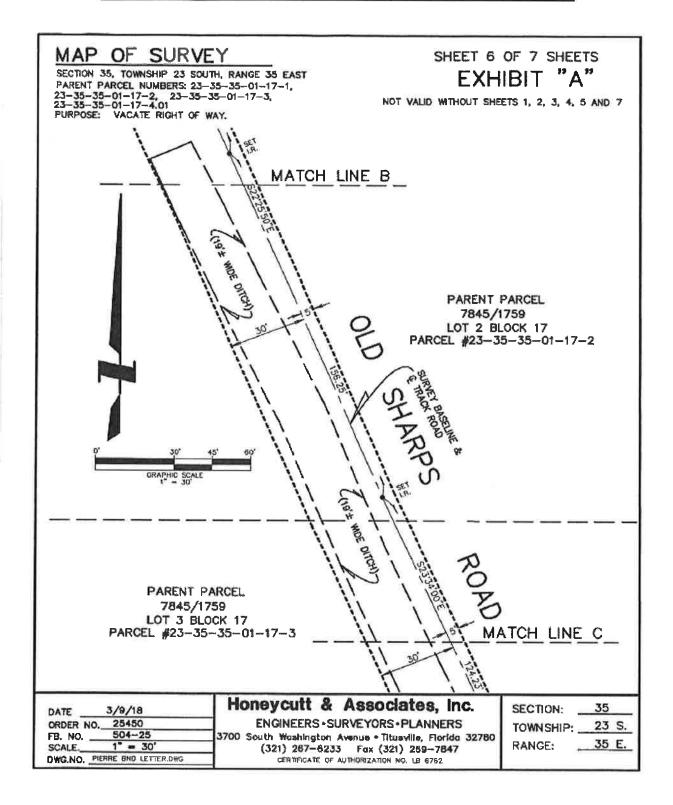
Copy of sketch sheet 6 of 7 of right-of-way Old Sharpes Road.
